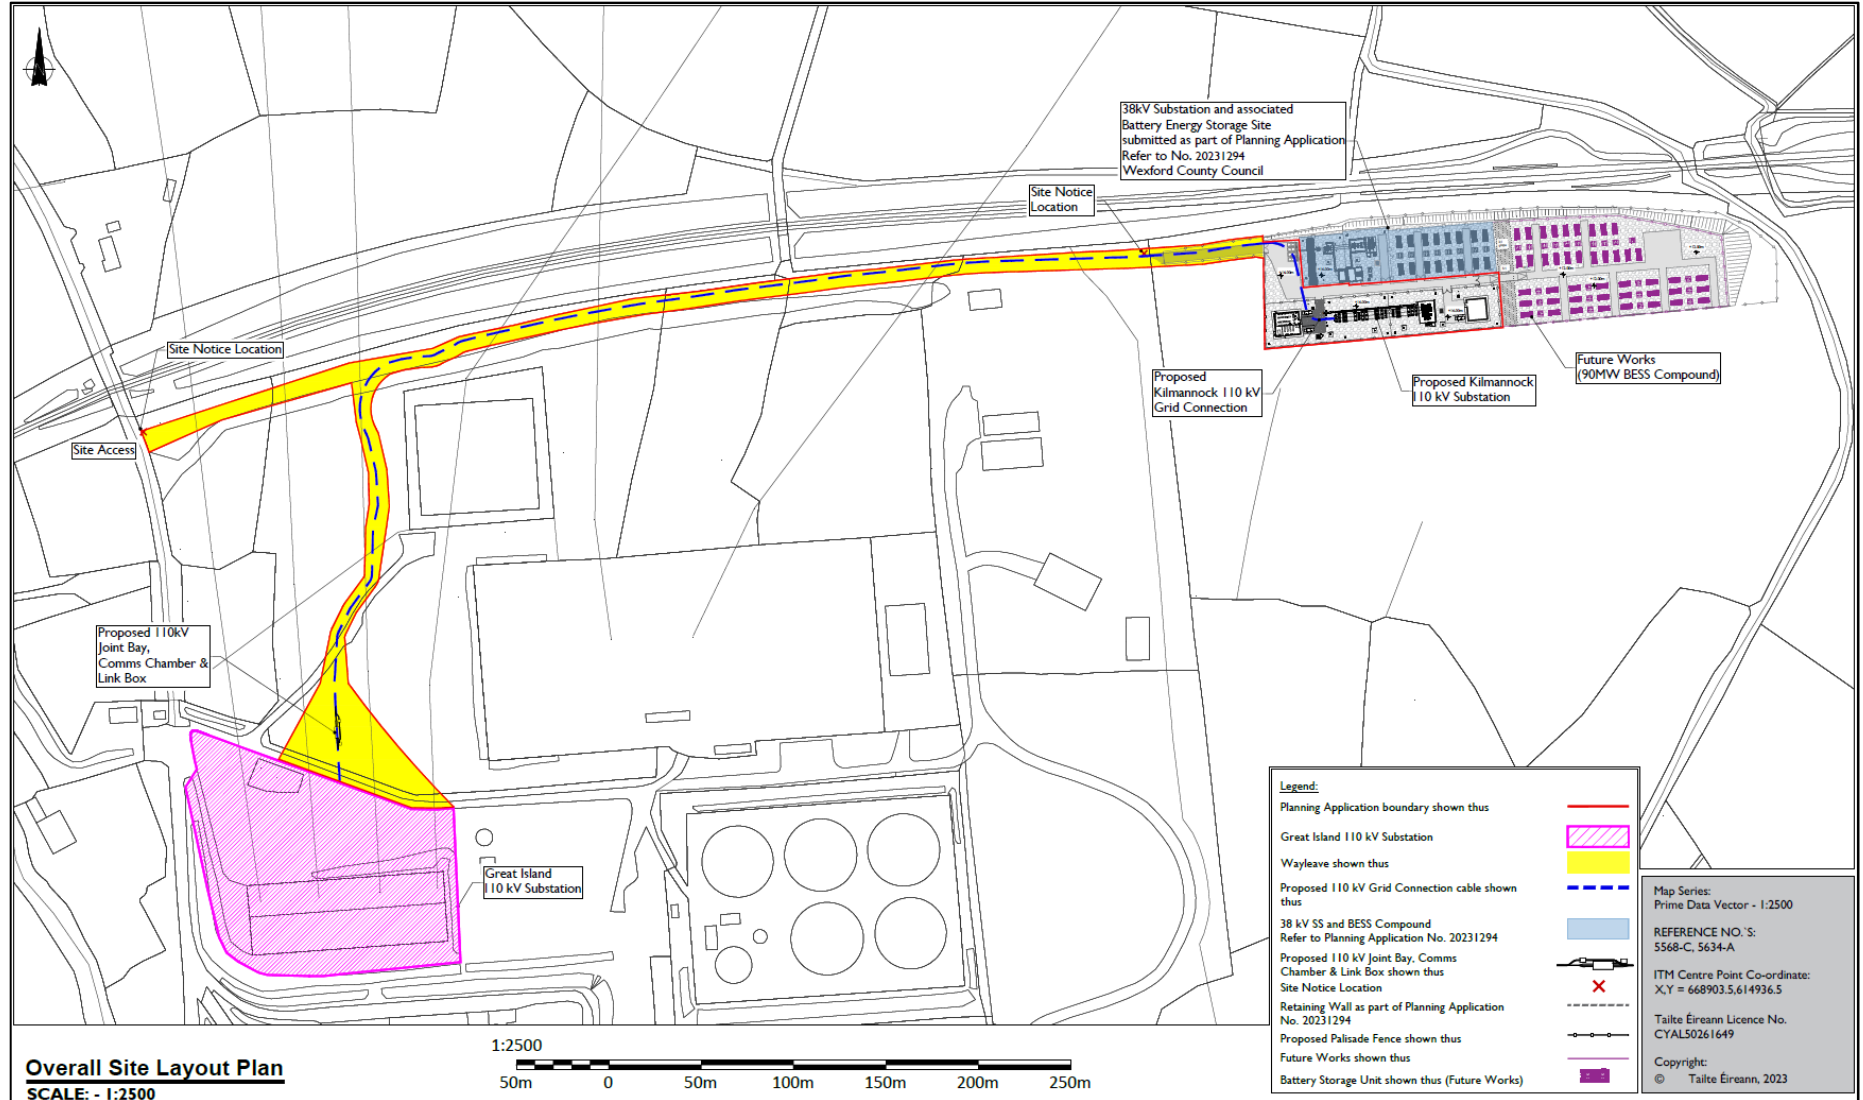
Proposed site layout plan (after TLI Group Ltd)
